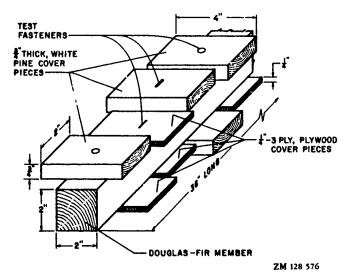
Arrangement and details of test specimens. Fasteners are located 2-1/4 in. on center, and staggered 1/2 in. Top and bottom locations are offset to avoid interference.
